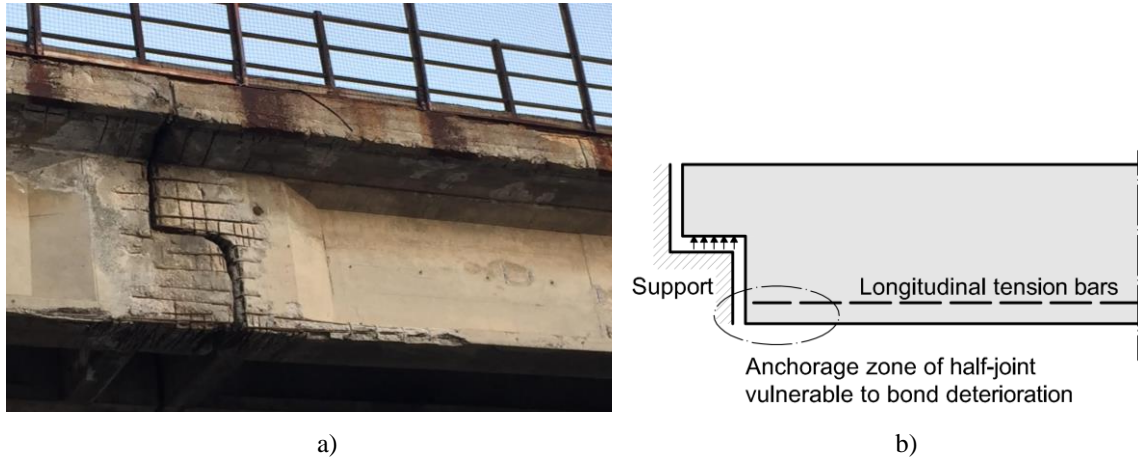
Deterioration of half-joint structures: a) Corrosion-induced spalling in a half-joint overpass; b) Absence of transverse support pressure on the anchorage zone of longitudinal reinforcement in the full-depth section of a half-joint.
